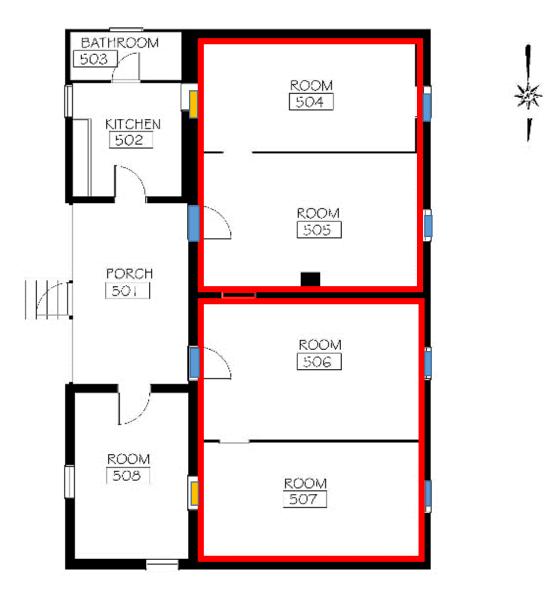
Slave quarter plan ca. 1823; two main rooms, two exterior doorways, two windows likely on the east and four windows on the west.
